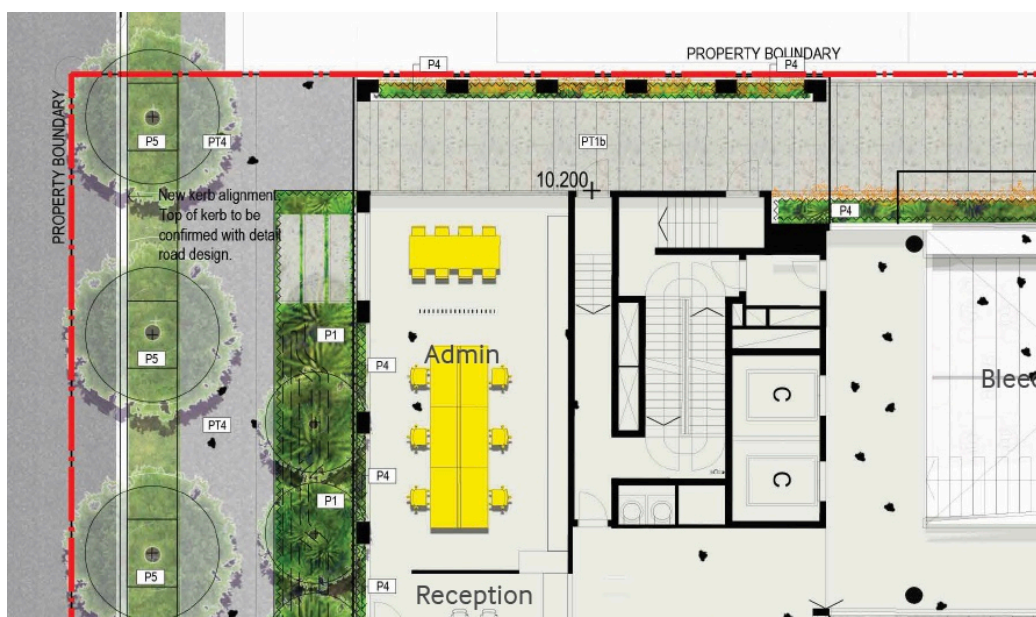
Revised Landscape Plan illustrating amended landscaping treatment to provide additional access to booster.
